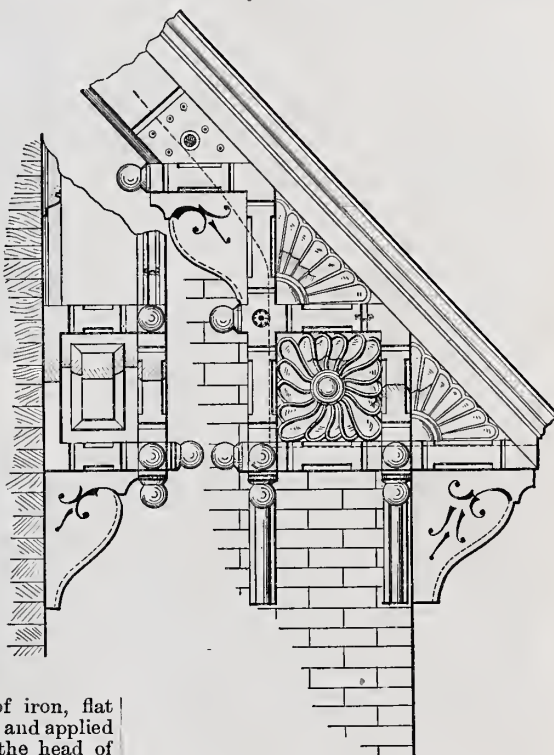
Details of North and Rear Gables.—Scale, 1/2 Inch to the Foot.
